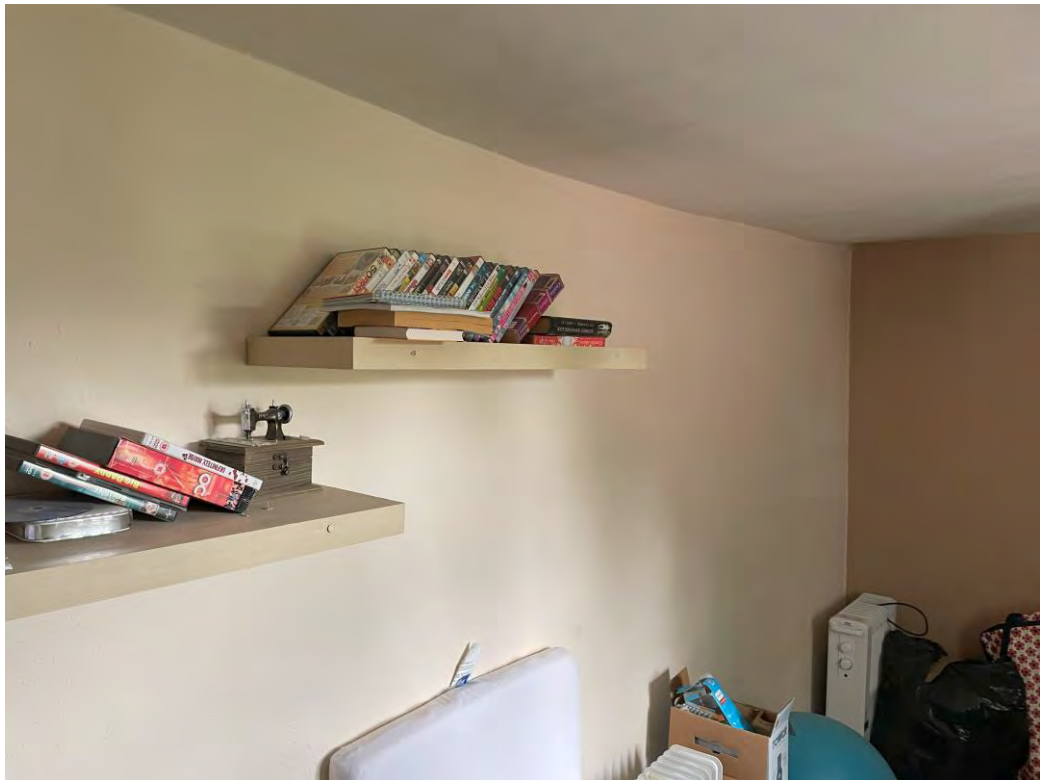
Modern stud wall to be removed between rooms 17 and 18.
